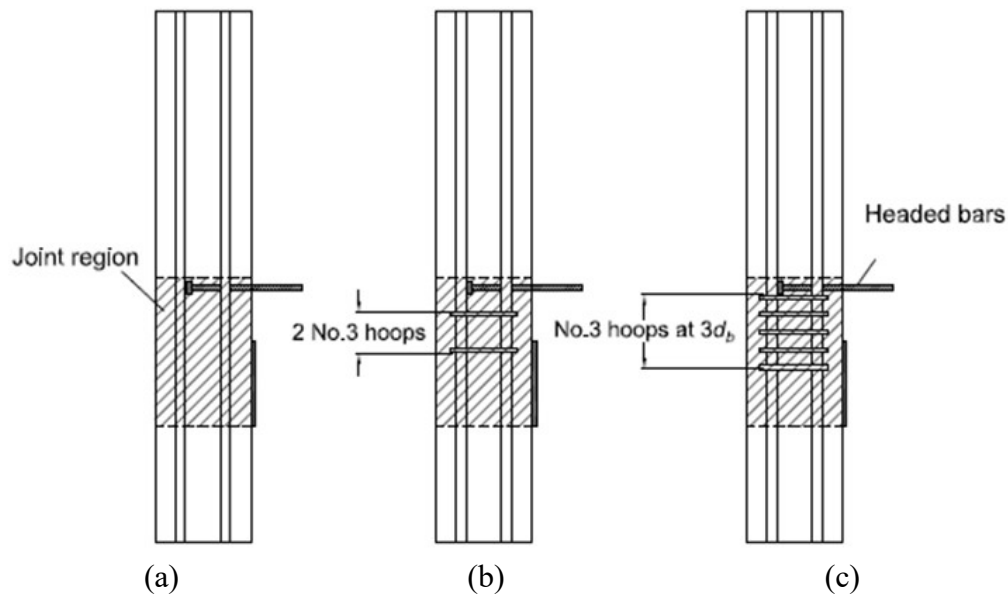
Confining reinforcement for beam-column joint specimens (a) no confining reinforcement, (b) two No. 3 hoops, (c) No. 3 hoops at $3d_b$ (Figure after Shao et al. 2016)
